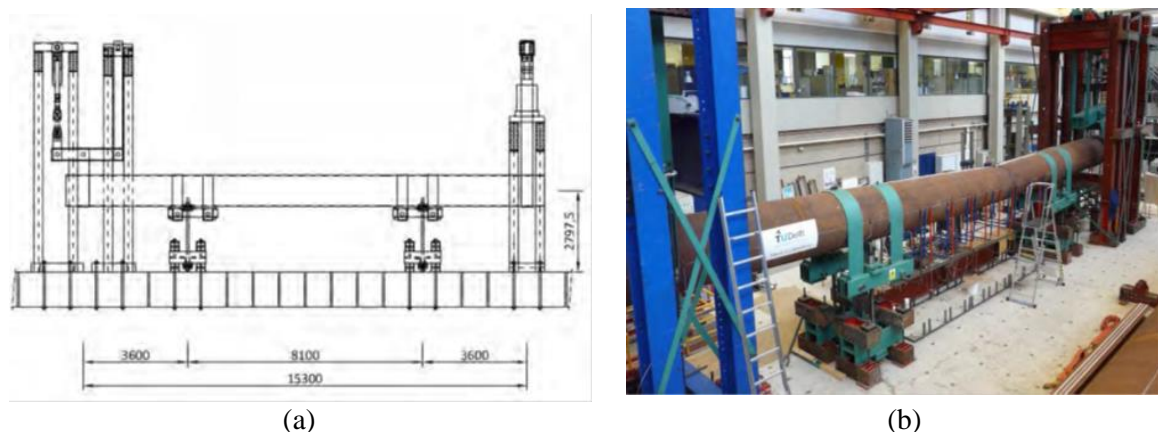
(a) Scheme of test set-up; (b) test set-up after formation of a local buckle [12].
